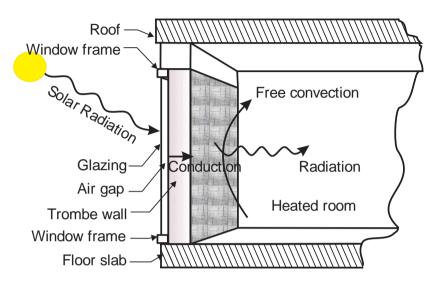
Cross-section of a building space utilizing a TW and the heat transfer mechanisms
